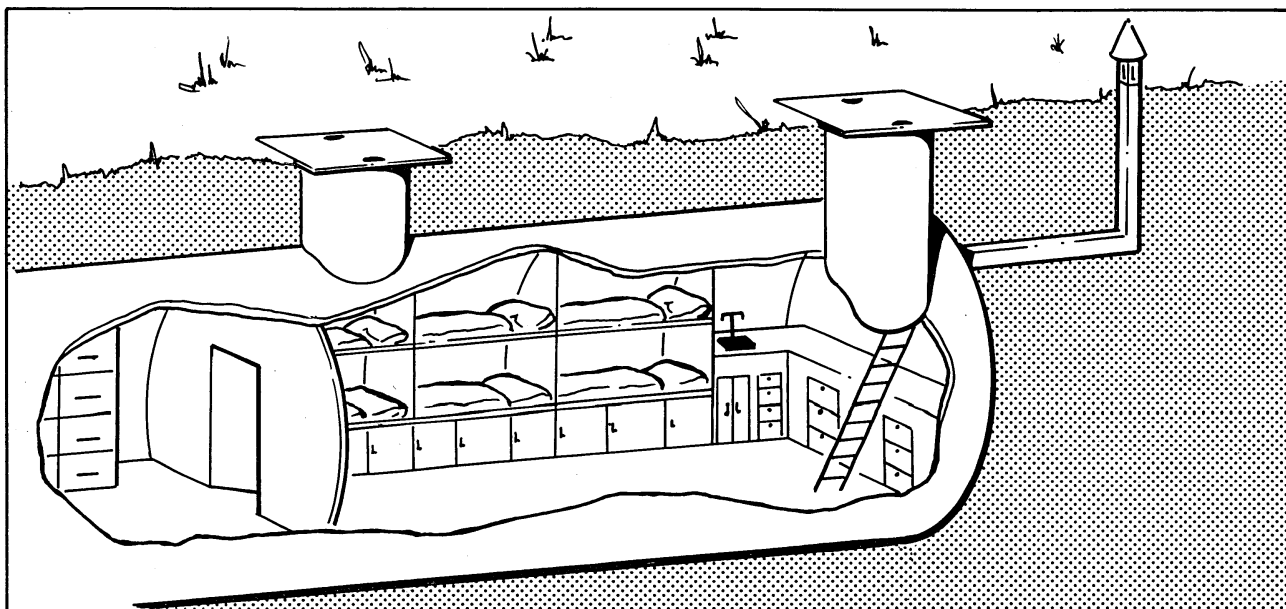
Part of a fallout shelter, made of steel and concrete and buried underground
